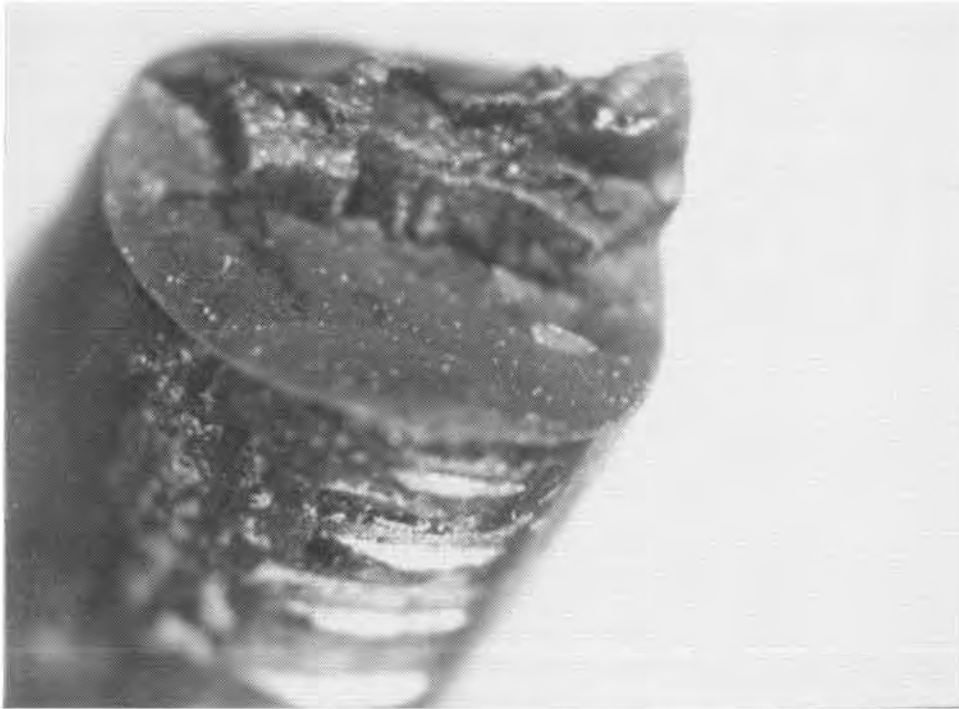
Outer wire failure in wedges of top anchorhead, strand 4
